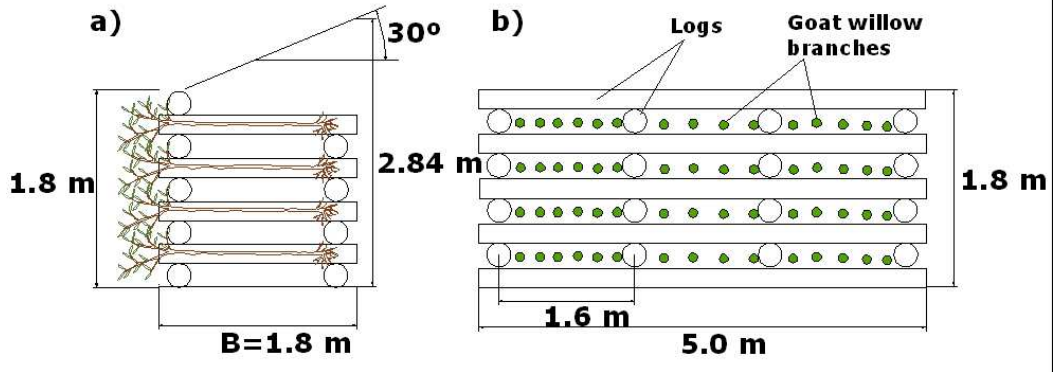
Log crib wall geometry a) cross-section, b) front-view
